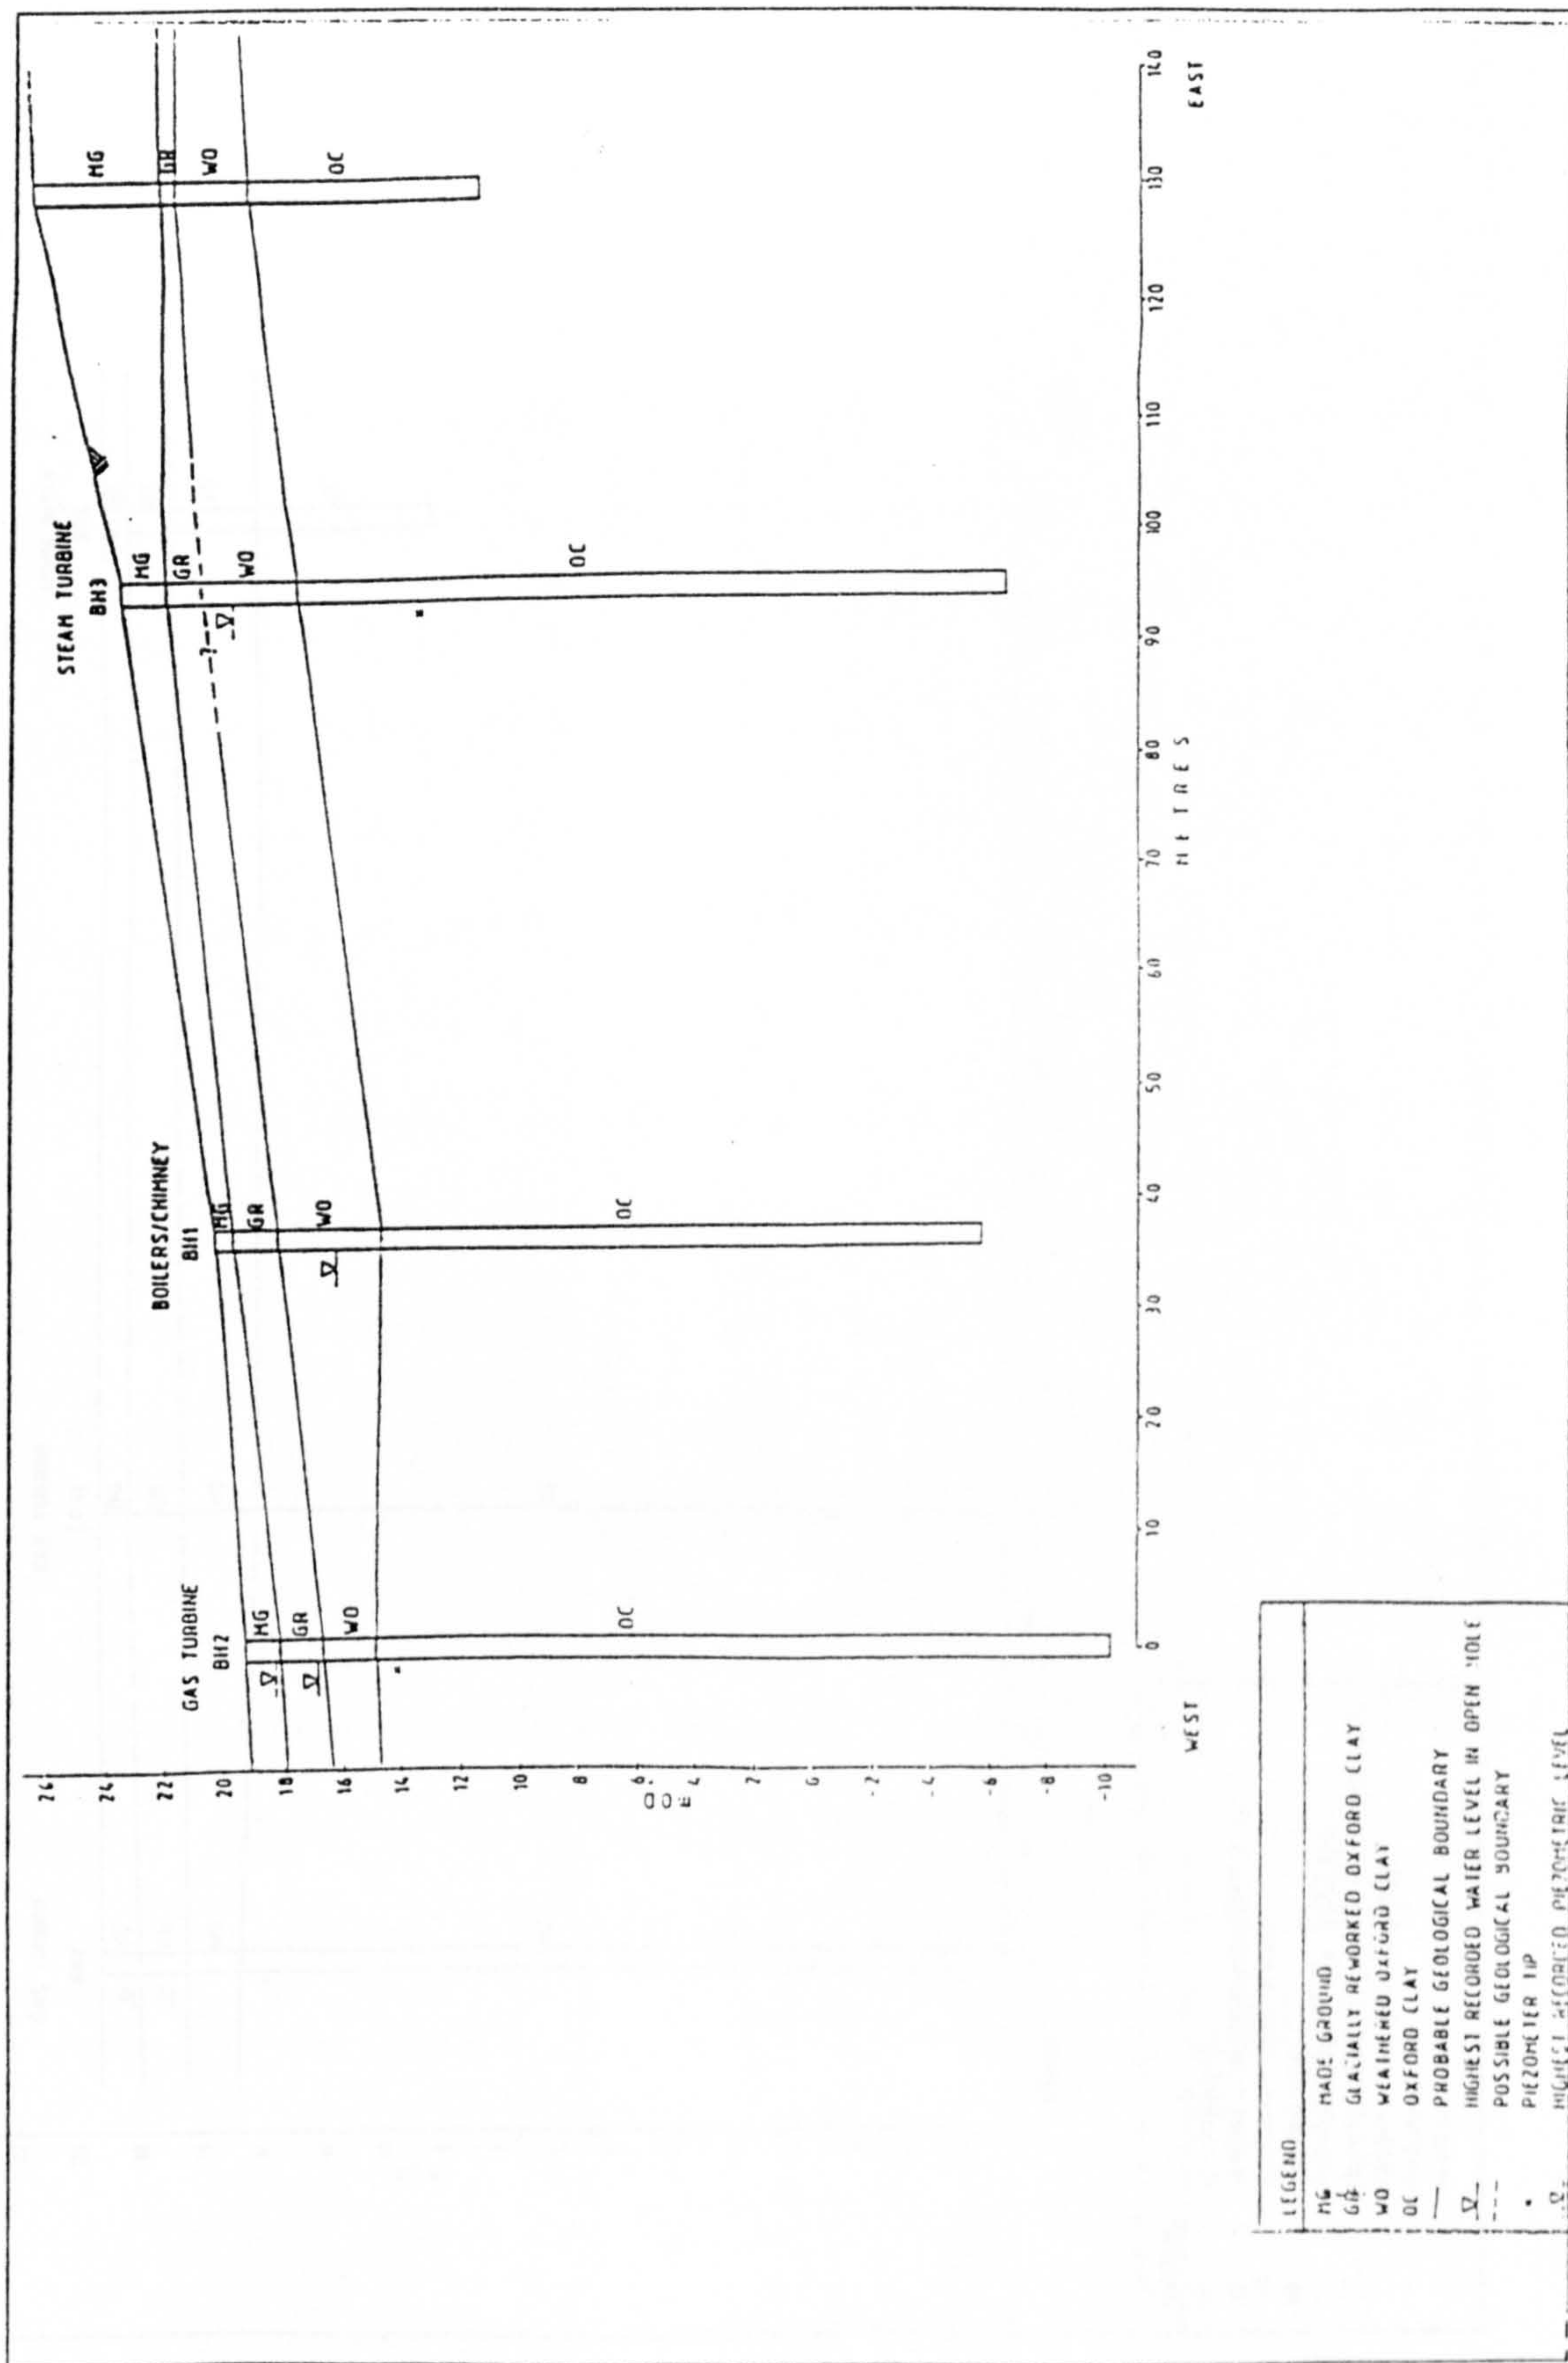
Cross-Section through Gas Turbine, Boilers and Steam Turbine
